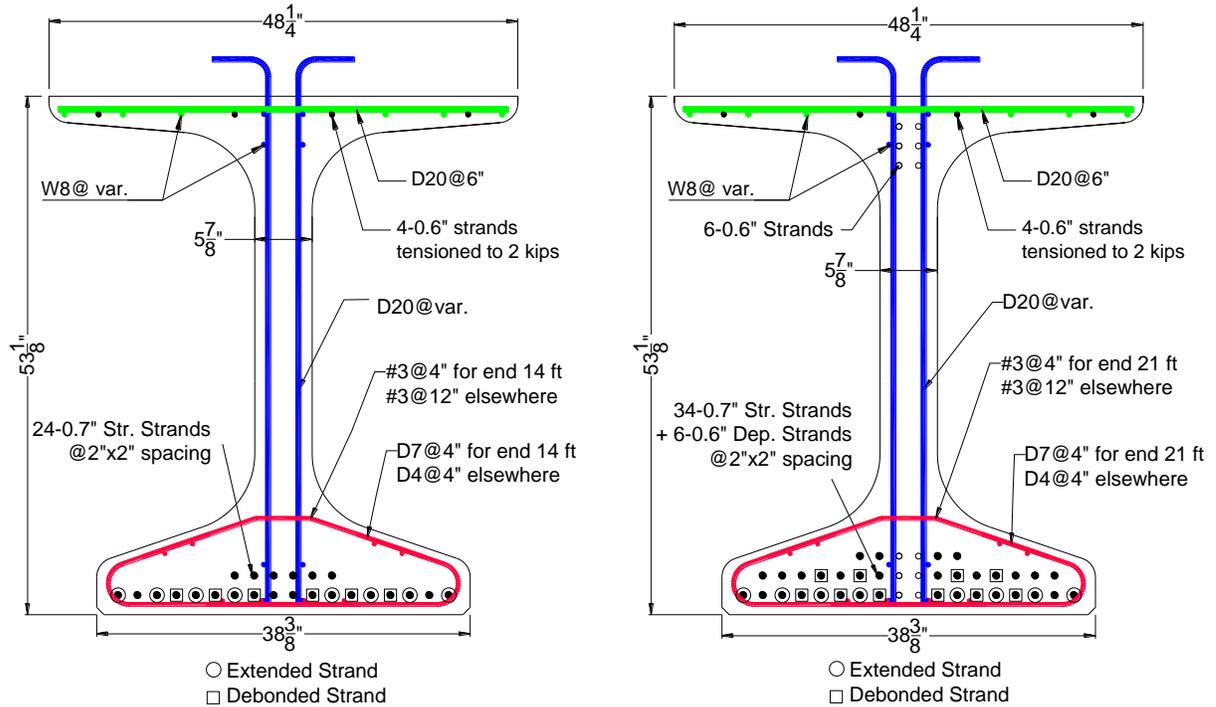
Dimensions and reinforcing details of NU1350 used for 110 ft spans (left) and 140 ft span (right)
